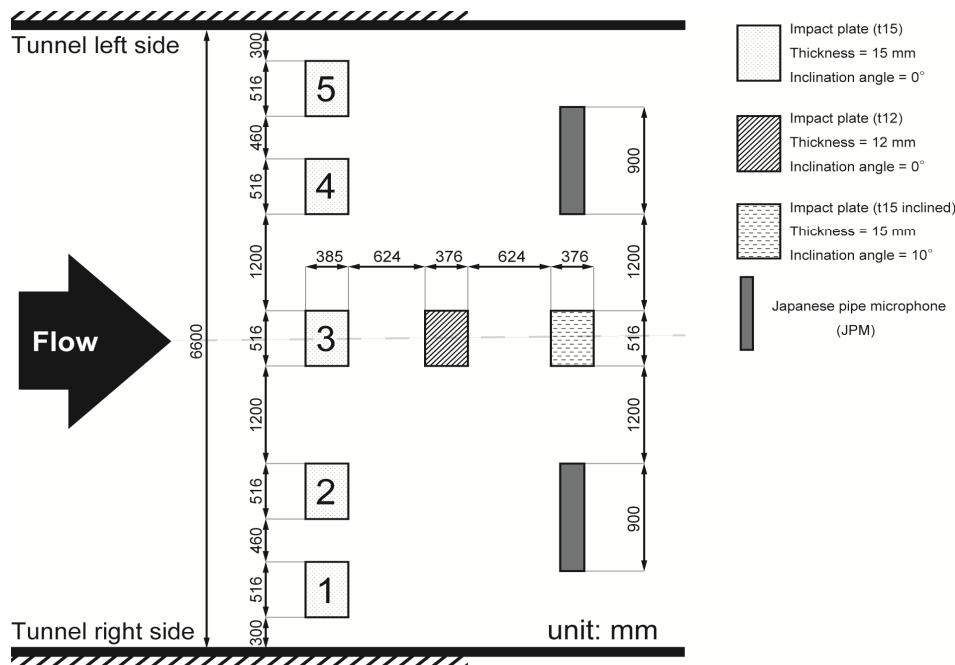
Plan view of bedload measurement apparatuses on the Koshibu dam SBT.
